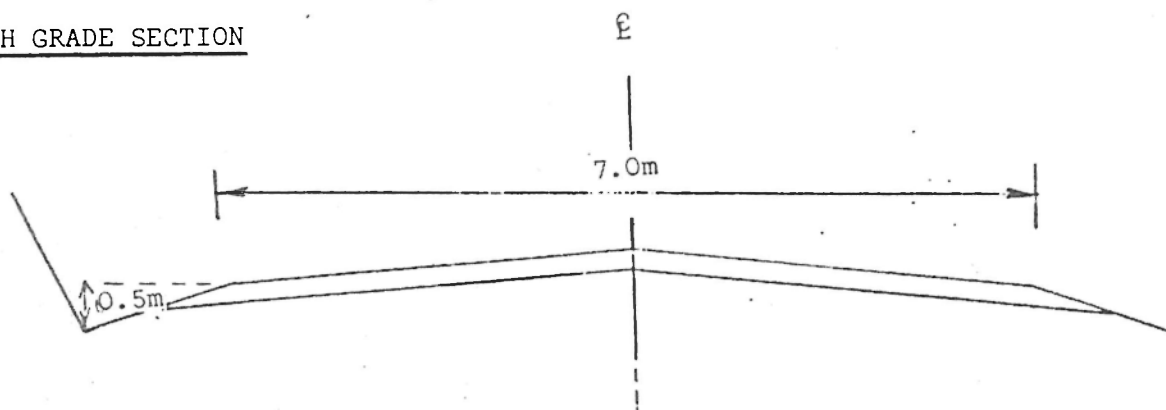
TYPICAL CROSS-SECTION FOR RURAL BITUMEN AND GRAVEL ROADS
